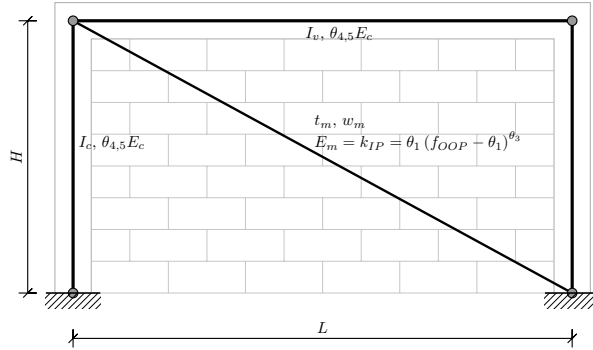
Elastic in plane macro model constructed in OpenSeespy.
